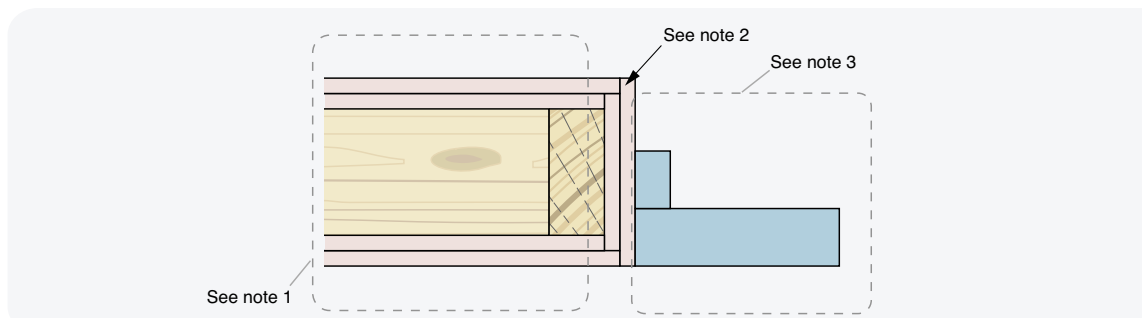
Access panel in a fire-protected timber-framed wall.
